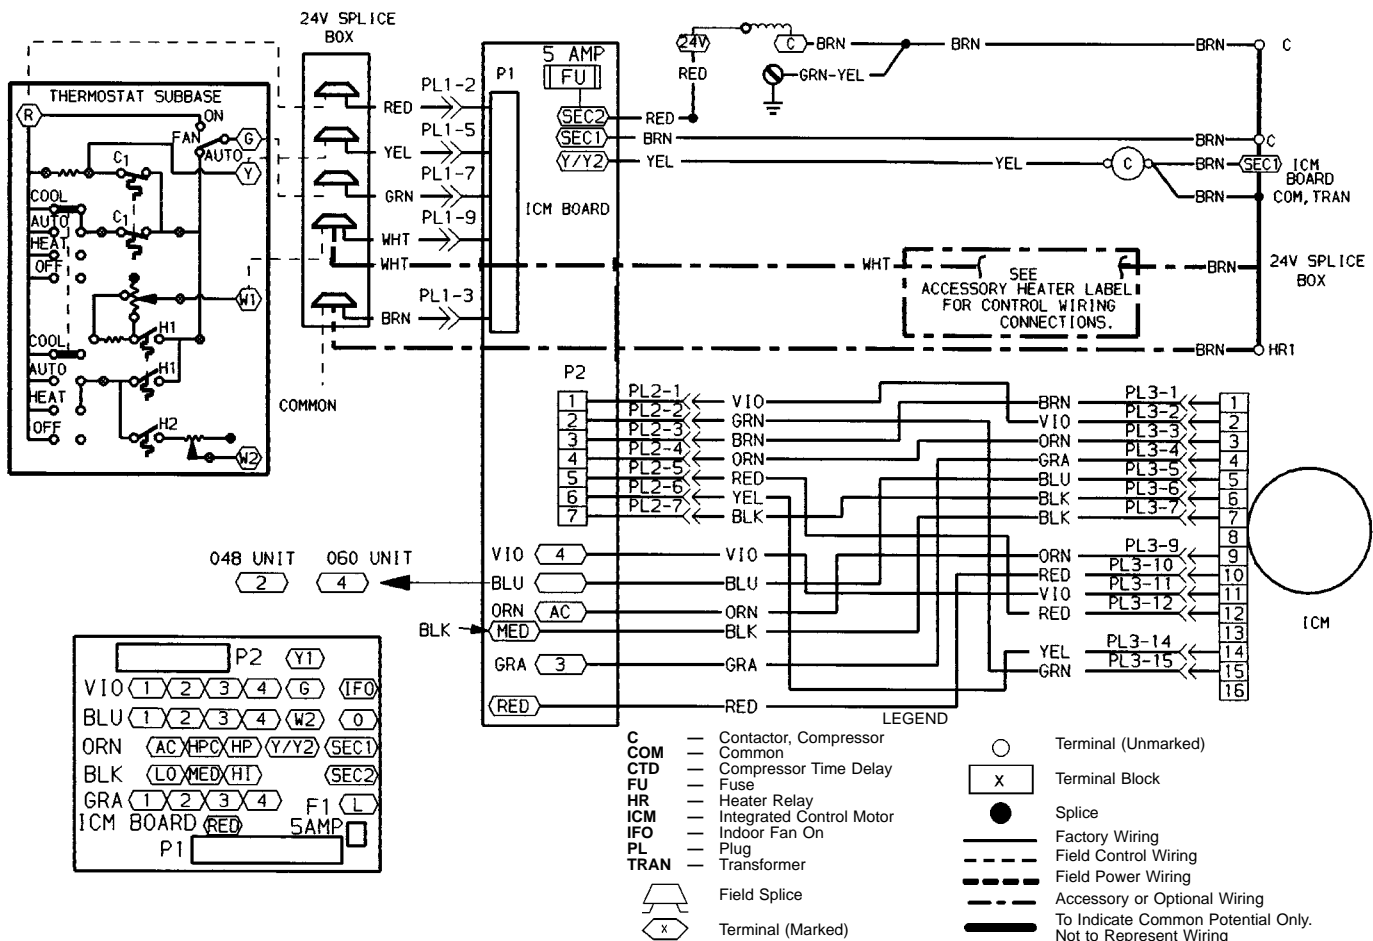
Unit 50SX048,060 — 208/230-3-60 Integrated Control Motor Wiring Schematic
